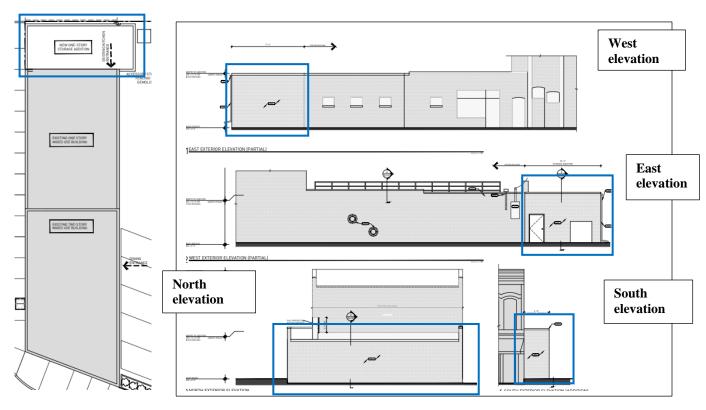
Drawings approved in 2019. Area outlined in yellow indicates proposed location of new rear addition
